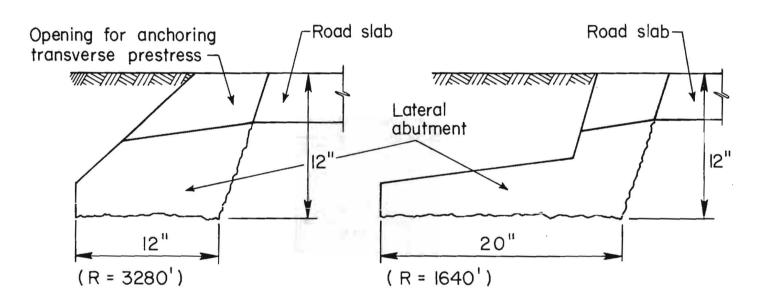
LATERAL ABUTMENTS ON CURVED SECTIONS OF HIGHWAY PAVEMENT AT ZWARTBERG-MEEUWEN, BELGIUM
